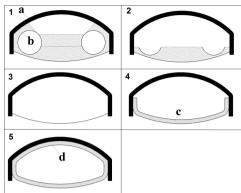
Construction stages of CAPS (Sadaghiani, Dadizadeh, 2010) (a,b: arc galleries; c: traverse horse shoe arc; d: piles; e: arch frame; f: TBM lining)
